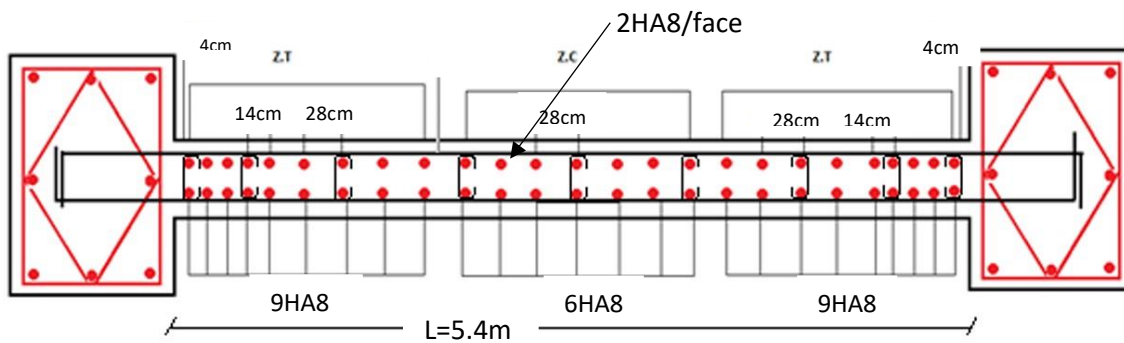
SHEAR WALL REINFORCEMENT DIAGRAM OF VY2(BASEMENT)
